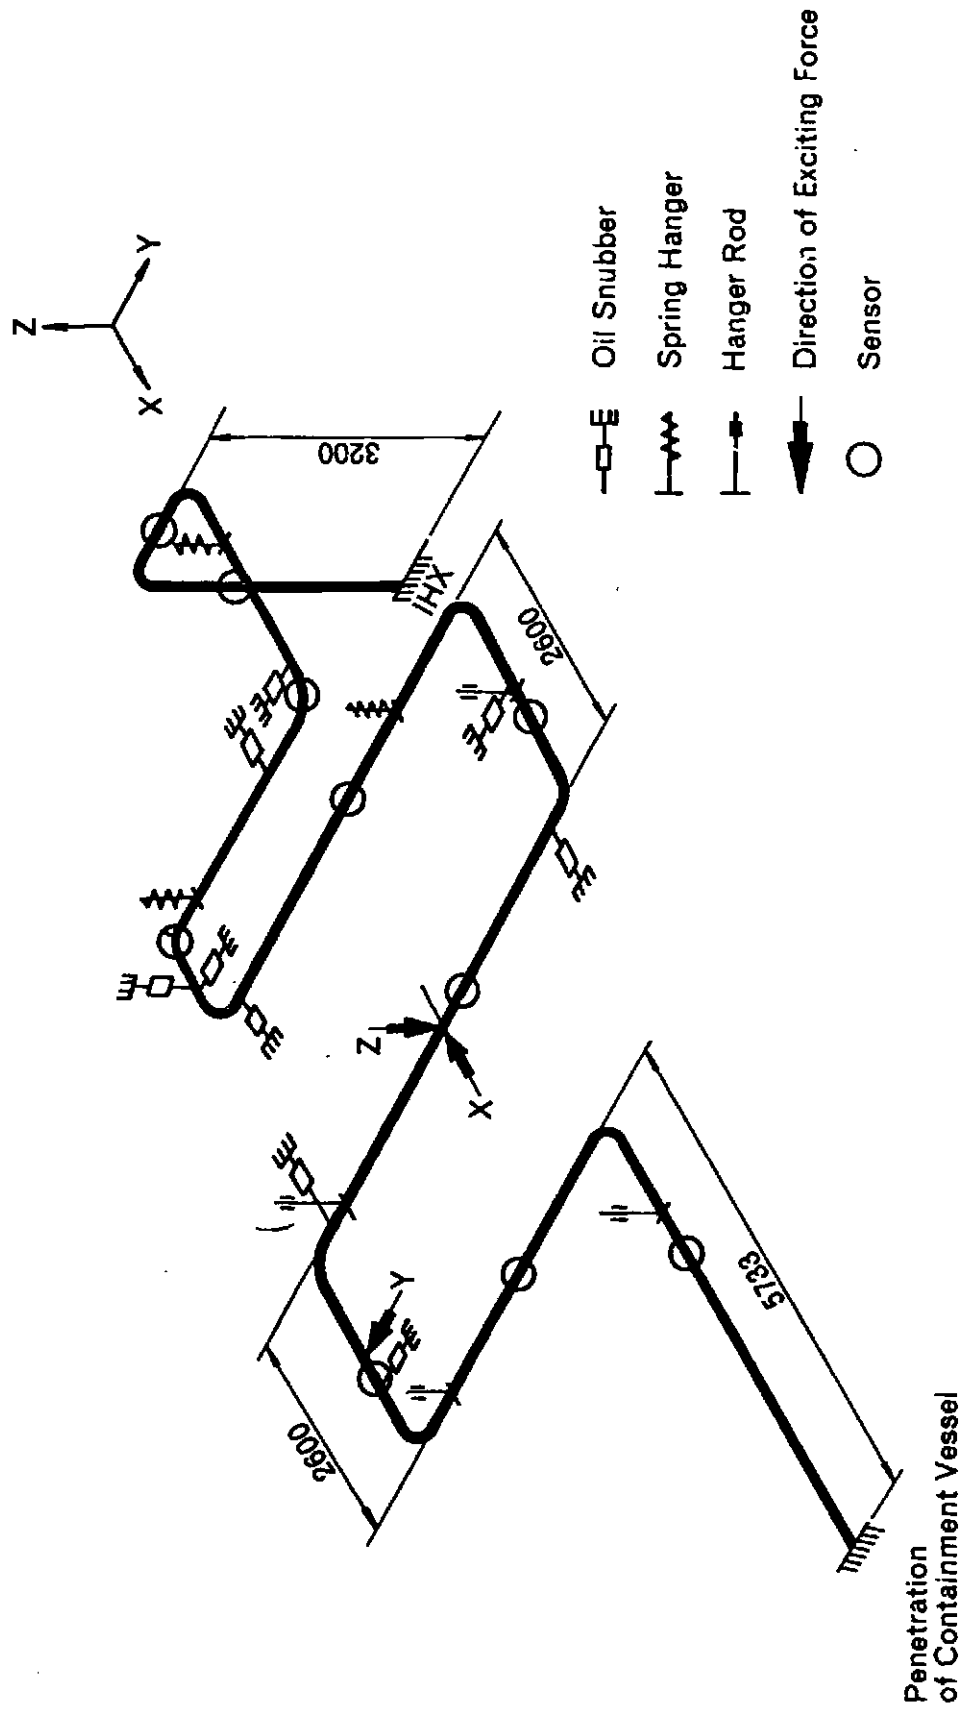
Piping Tested on the Secondary Loop(12 inch)
